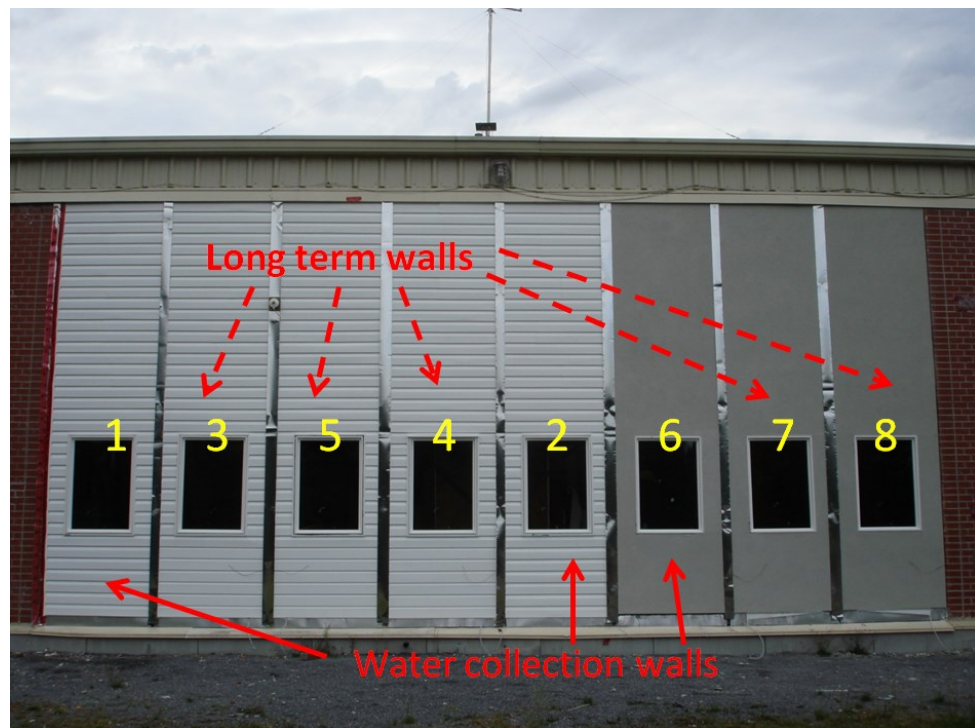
Configurations of water collection and long-term performance, vinyl sidings, and stucco cladded walls on SE facade of test facility. The numbers represent the specimen panel
